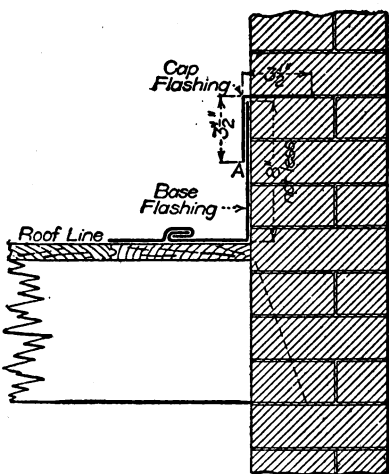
Cap and Base Flashing on Main Roof and brick walls should be painted in similar manner and should be turned up not less than 8 inches from the roof line and should be "base flashed."
